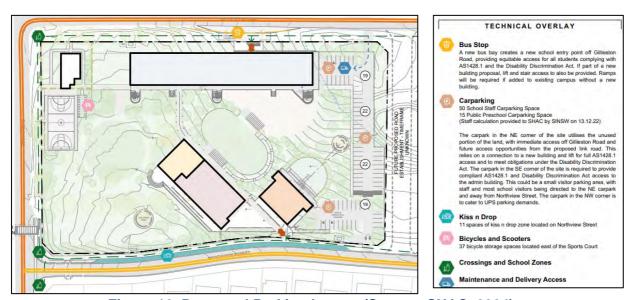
Proposed Parking Layout (Source: SHAC, 2024)
